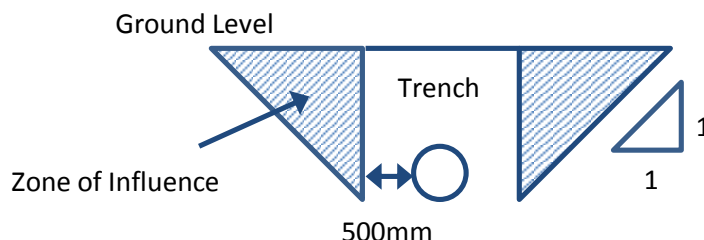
For clay, soil etc., the ZOI shall be 1 vertical: 1 horizontal.
